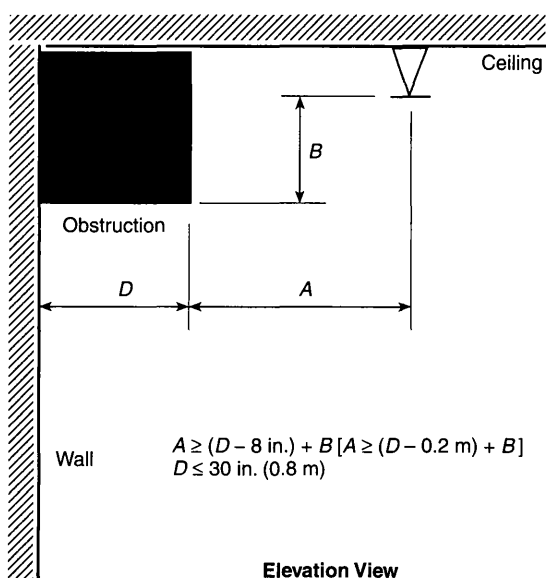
(b) Obstructions Against Walls (SSU/SSP).
